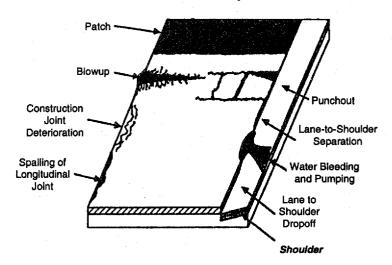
Miscellaneous defects of continuously reinforced concrete pavement
